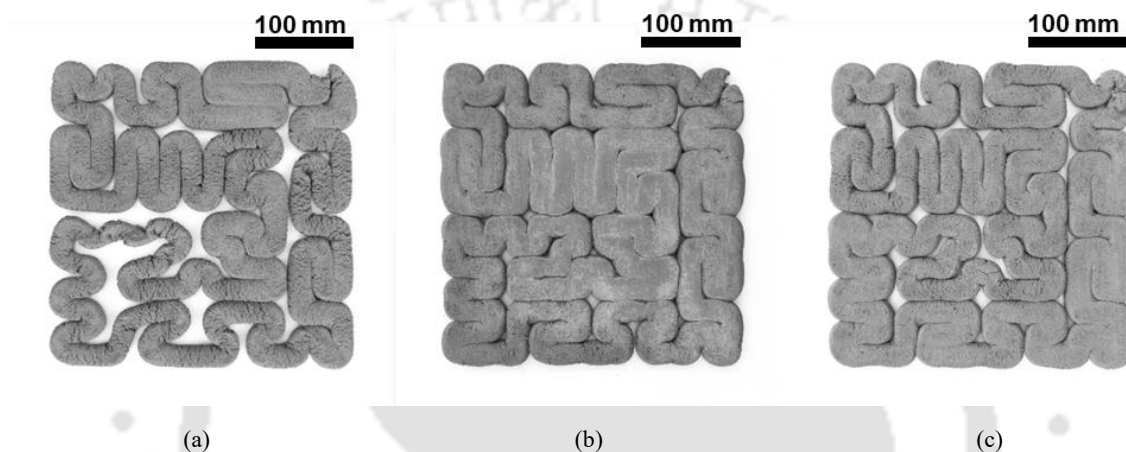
Square shape printed using TSP toolpath with (a) Sharp turns, (b) 2 mm fillet, and (c) 3 mm fillet at every sharp turn.
